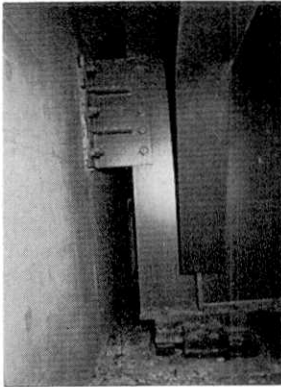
Damage to a protection device which prevent a girder from falling (Isuzu Bridge).
